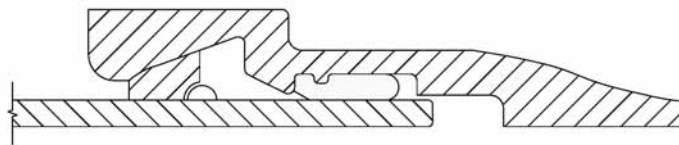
Enhanced Throw Welded Steel Pipe Joint (unrestrained)
